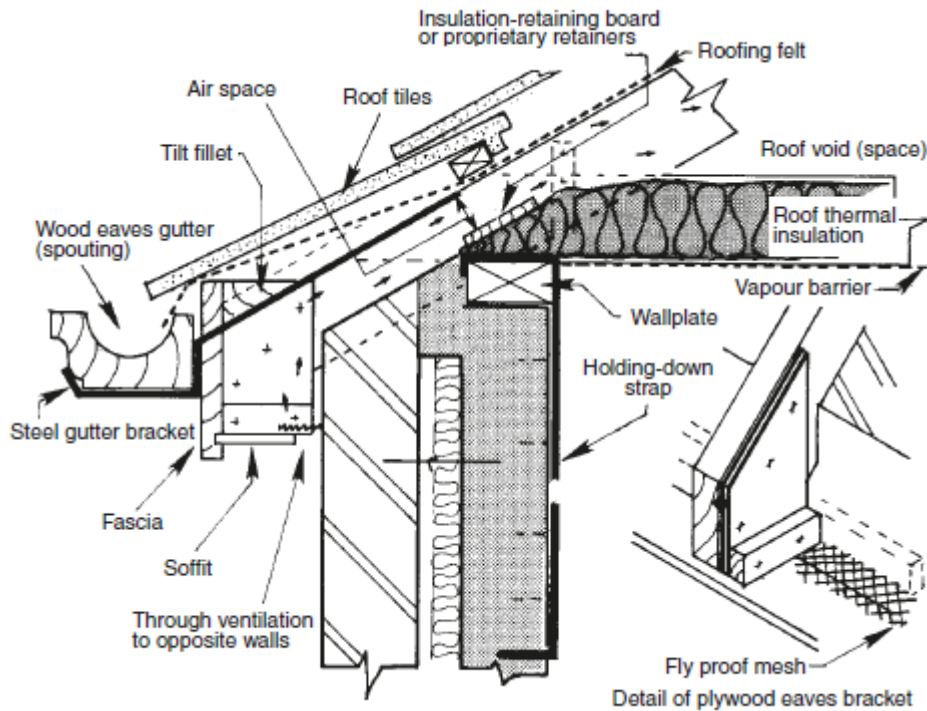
Insulation and eaves detail (traditional roof construction)
